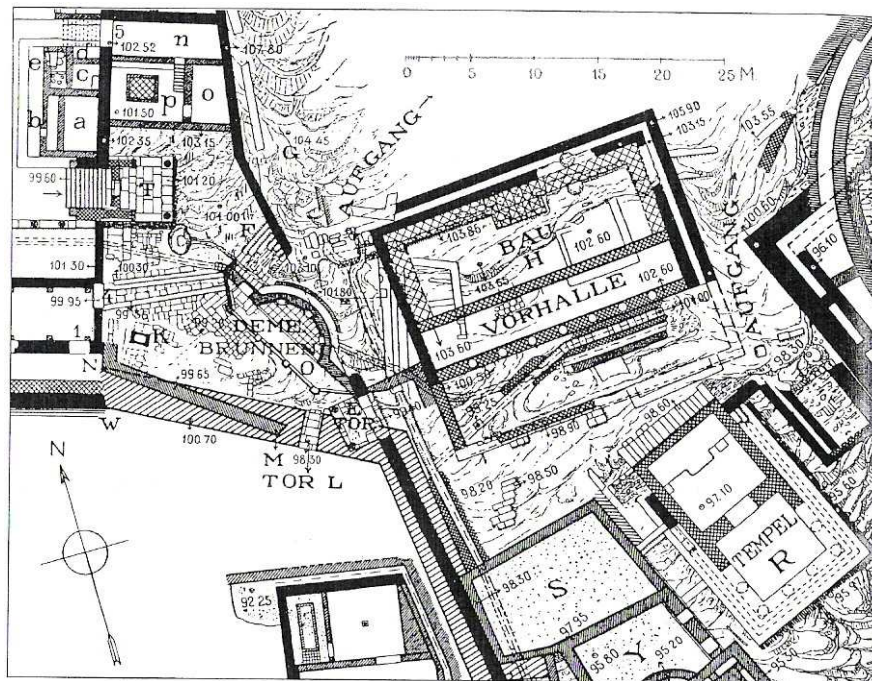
Plan of the Building H and the adjacent area at Pergamon.
